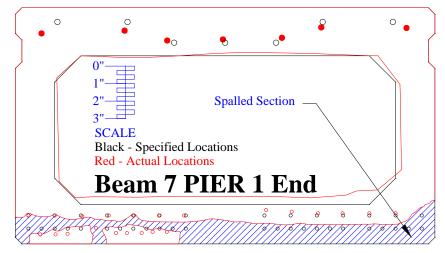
As-Built Section Geometry of Span 1 Beam 7 of Lakeview Drive Bridge
